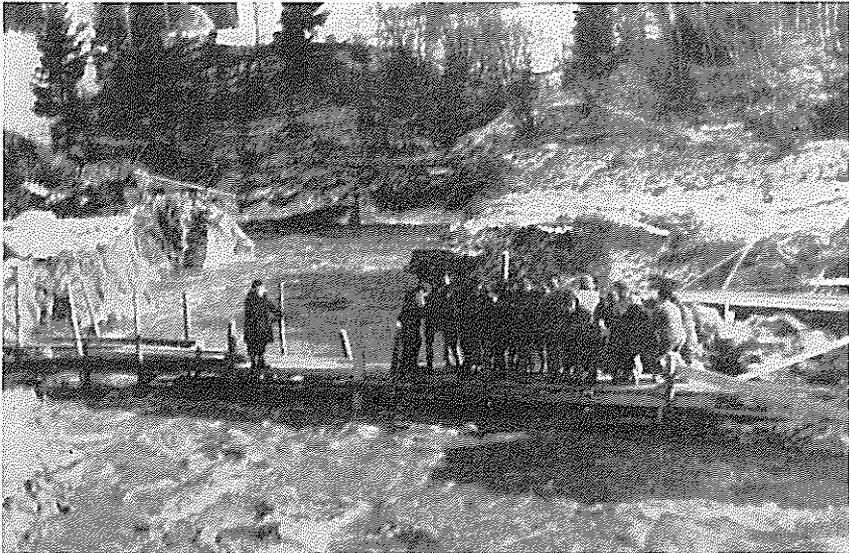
Protective measures for the Lidaberg slope. Constructing pile yokes.
